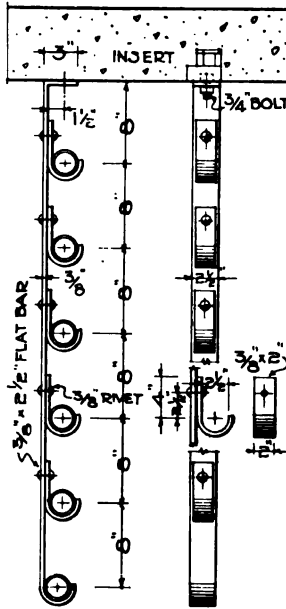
DETAIL OF HANGER FOR WALL PIPES.
